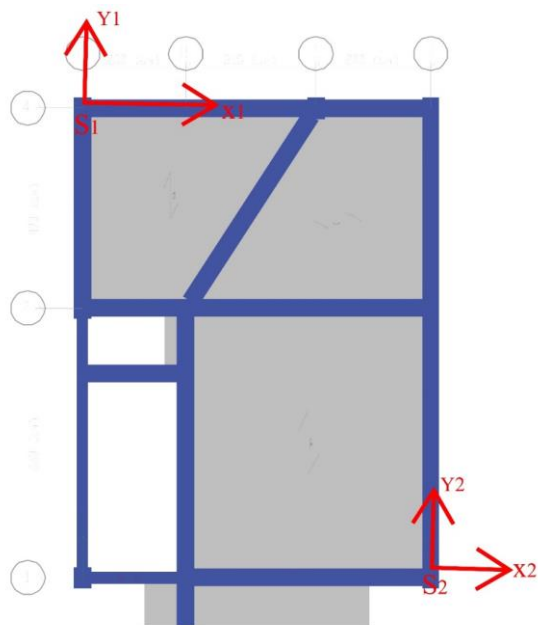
Plan of Second Floor with Sensor Placement for tasted six-story building.
